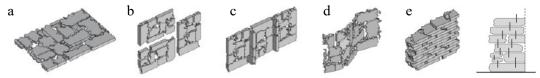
Geometric arrangement options for wall stability and section of connection strategy.
